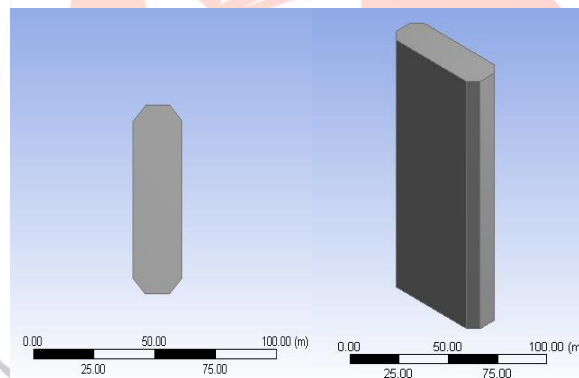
Plan and isometric view of rectangular model with chamfered corner
